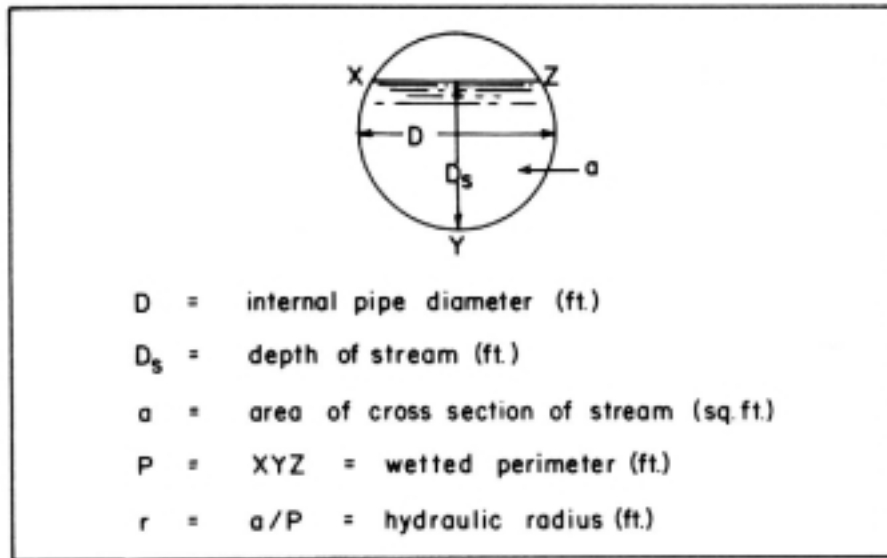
Cross Section of Cast Iron Soil Pipe Open Channel Sewer or Drain
